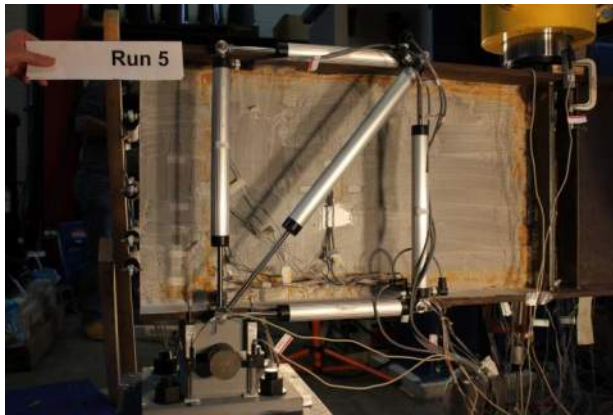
Undamaged Girder Right: 120 kip
